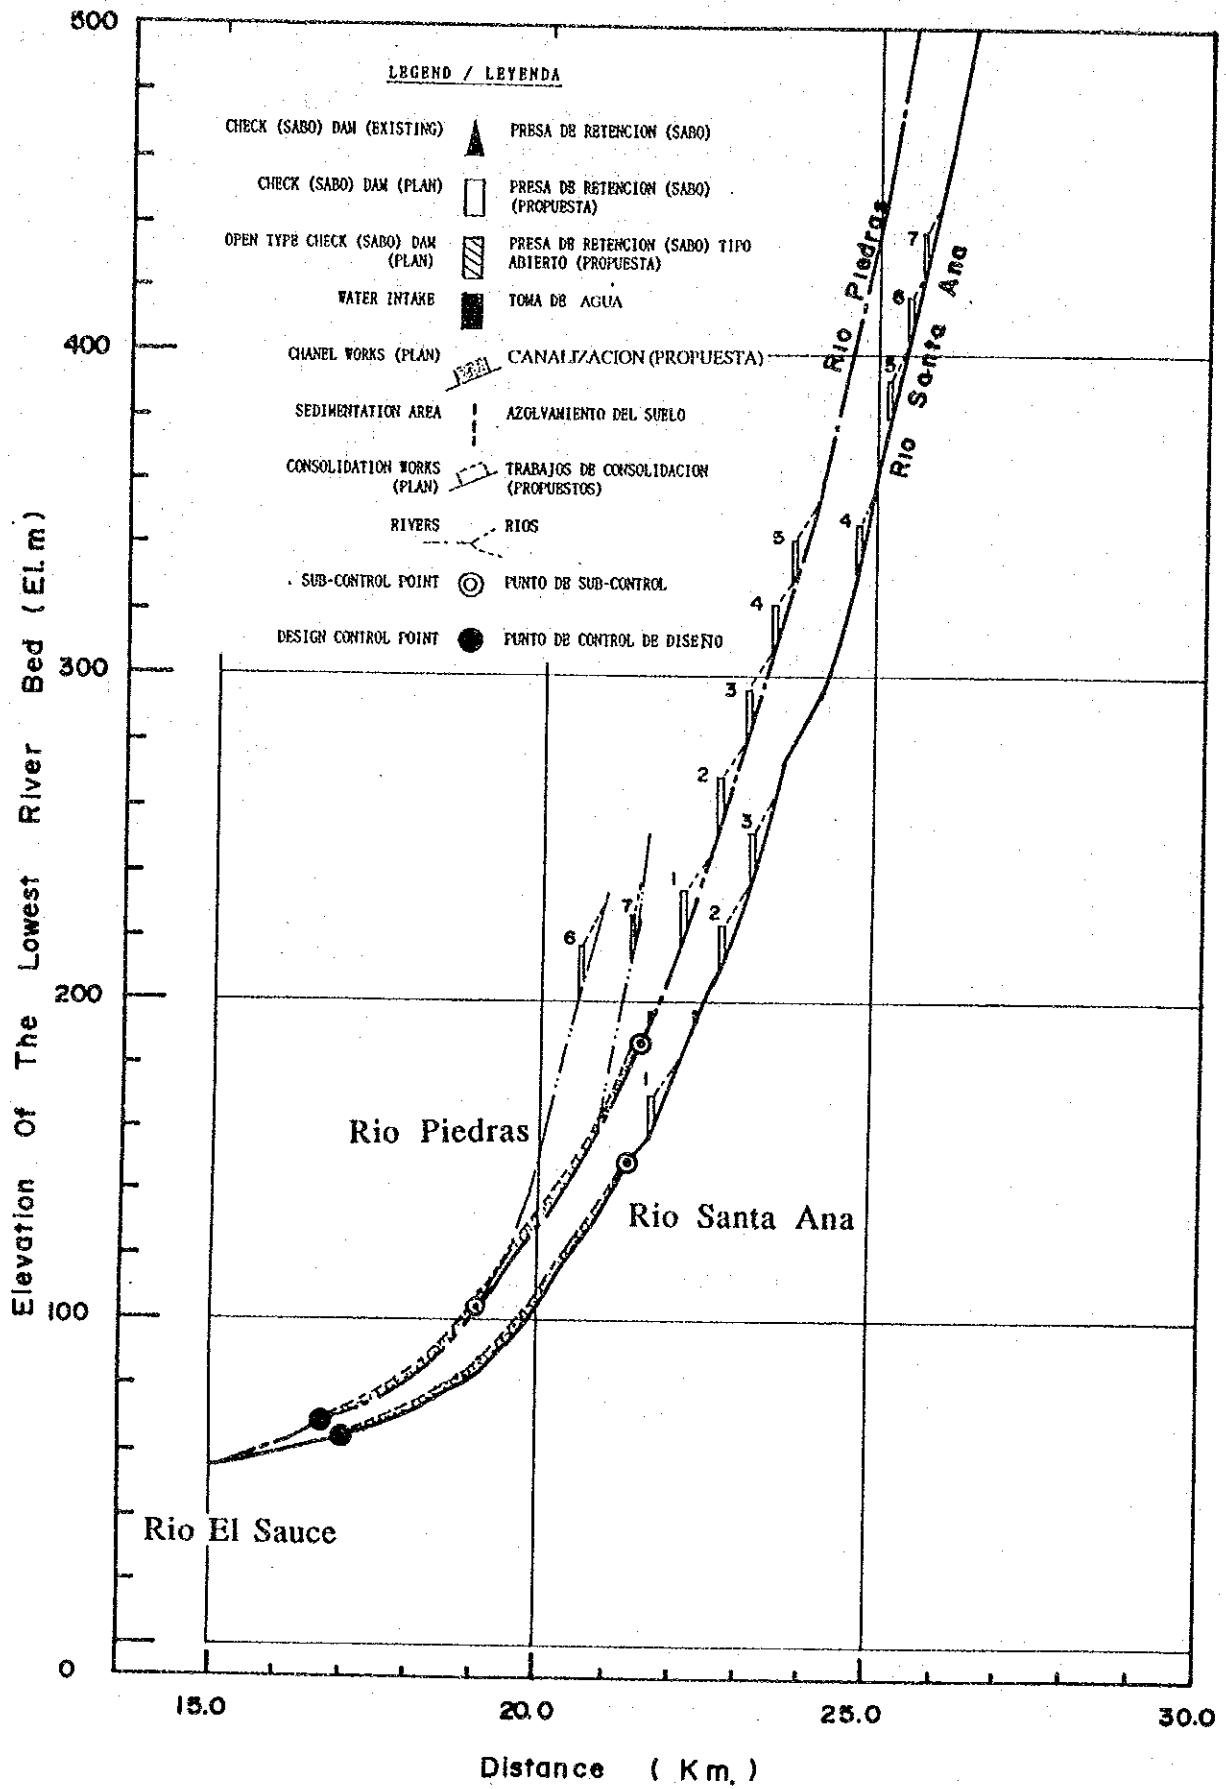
(3) LONGITUDINAL PROFILE OF EROSION CONTROL FACILITY ARRANGEMENT (RIO EL SAUCE)
